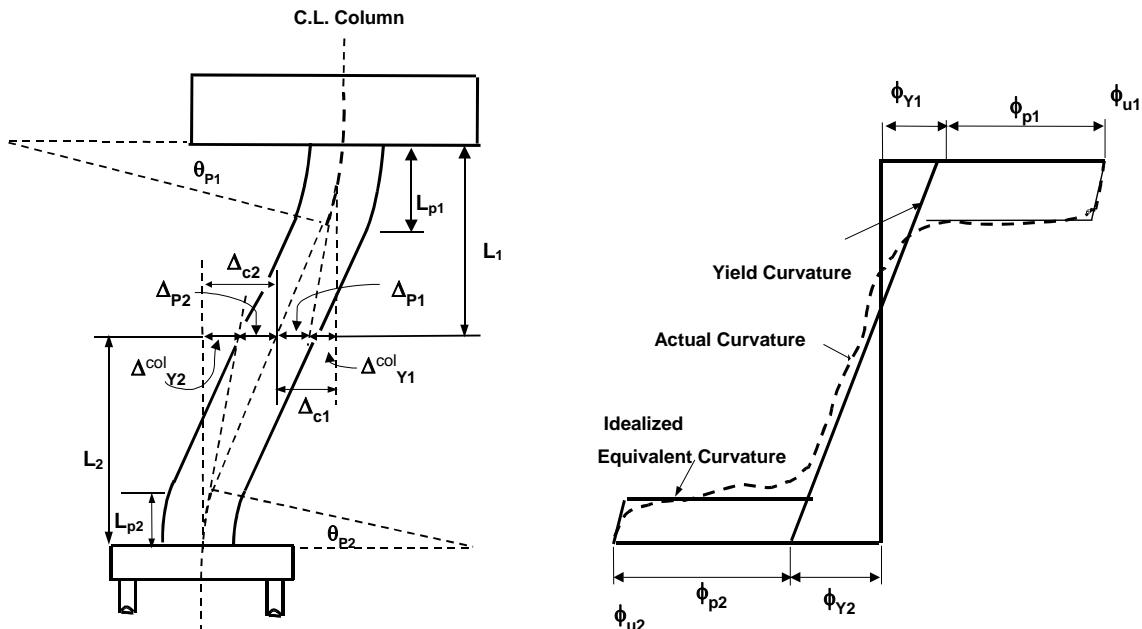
Local Displacement Capacity – Framed Column, Assumed as Fixed-Fixed
